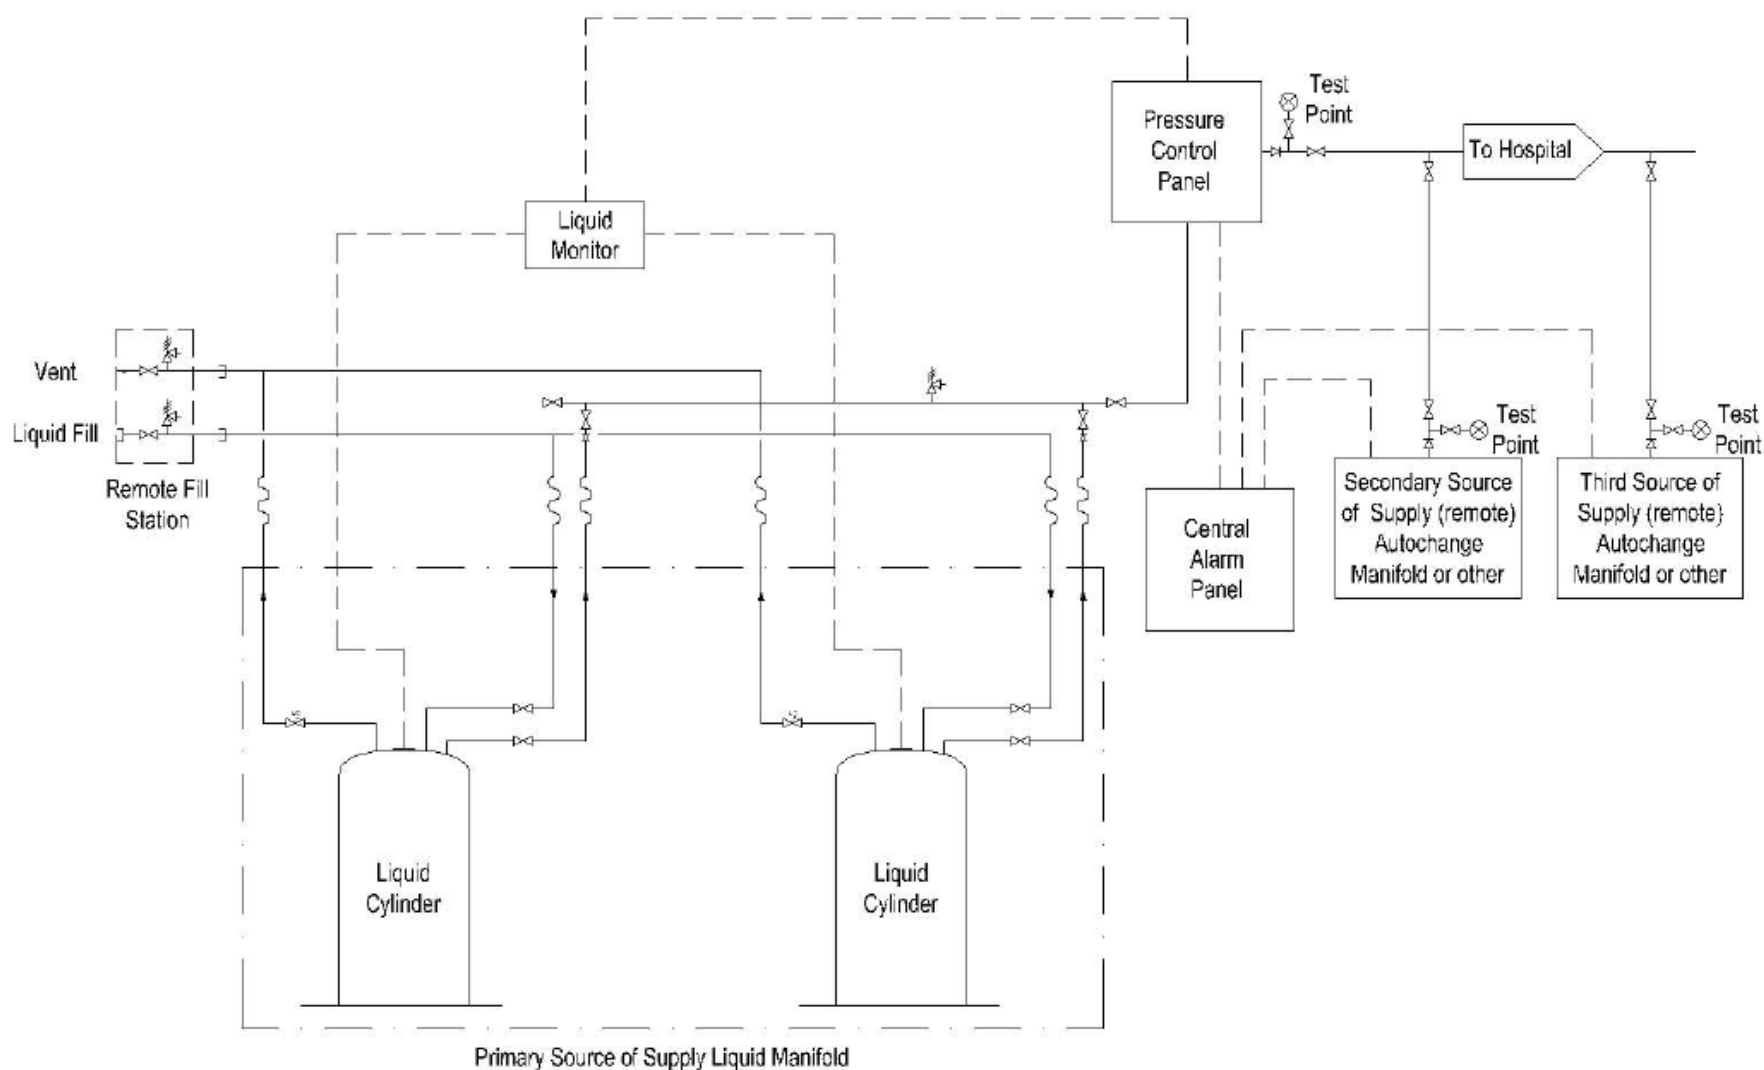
Typical primary liquid cylinder manifold installation with remote secondary supply source compressed gas cylinder manifold and remote third source supply
